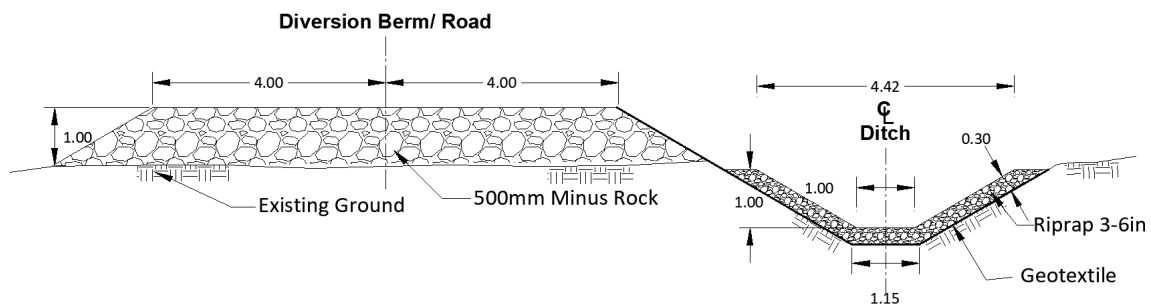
Ditch and modified Diversion Berm typical cross section.
